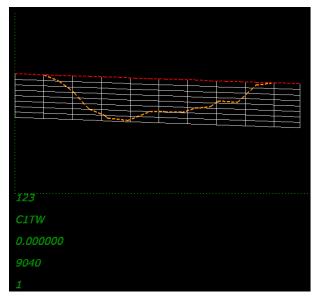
Place MSE Wall Cells (8'x Wall Lift Height)
